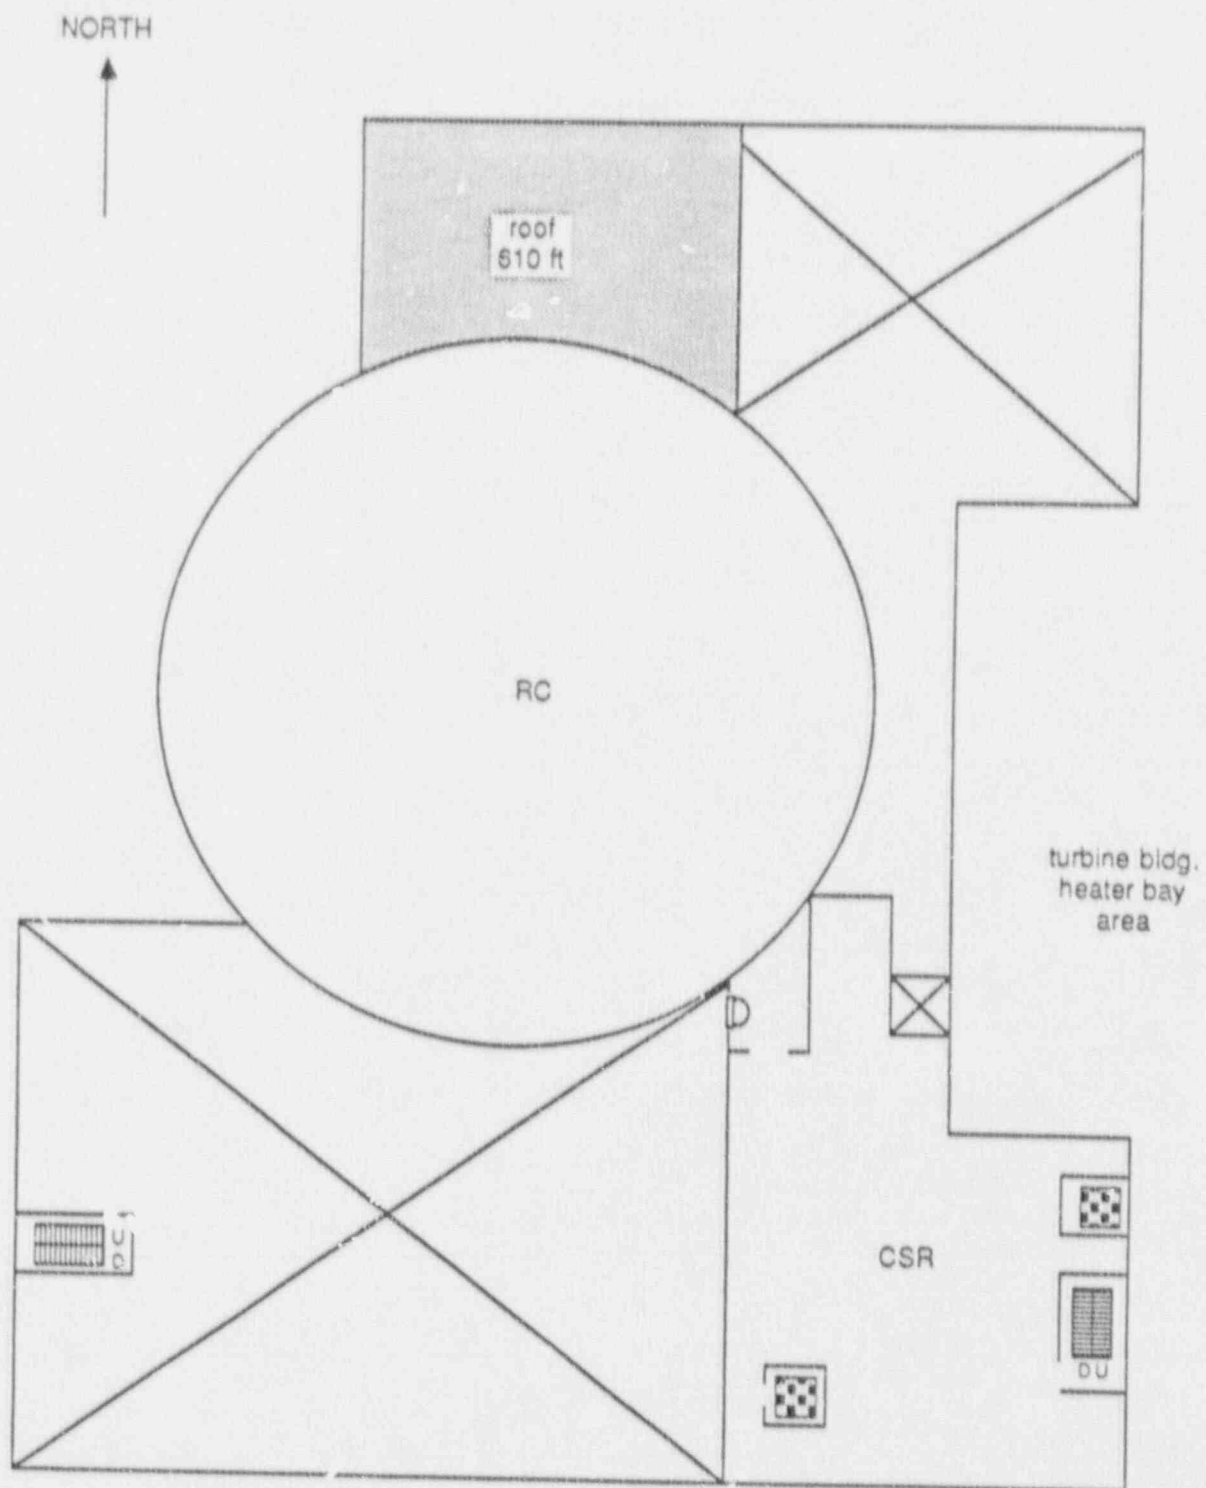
Davis-Besse Containment and Auxiliary Buildings, Elevation 613 feet
